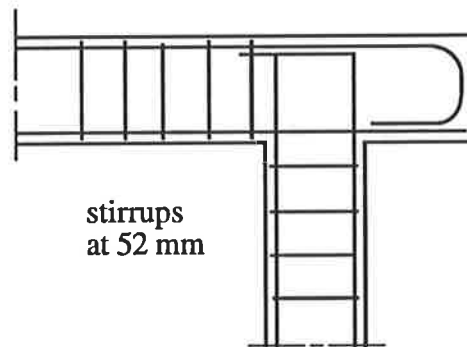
Corner detailing for frames (Ferguson and Breen, 1966)
